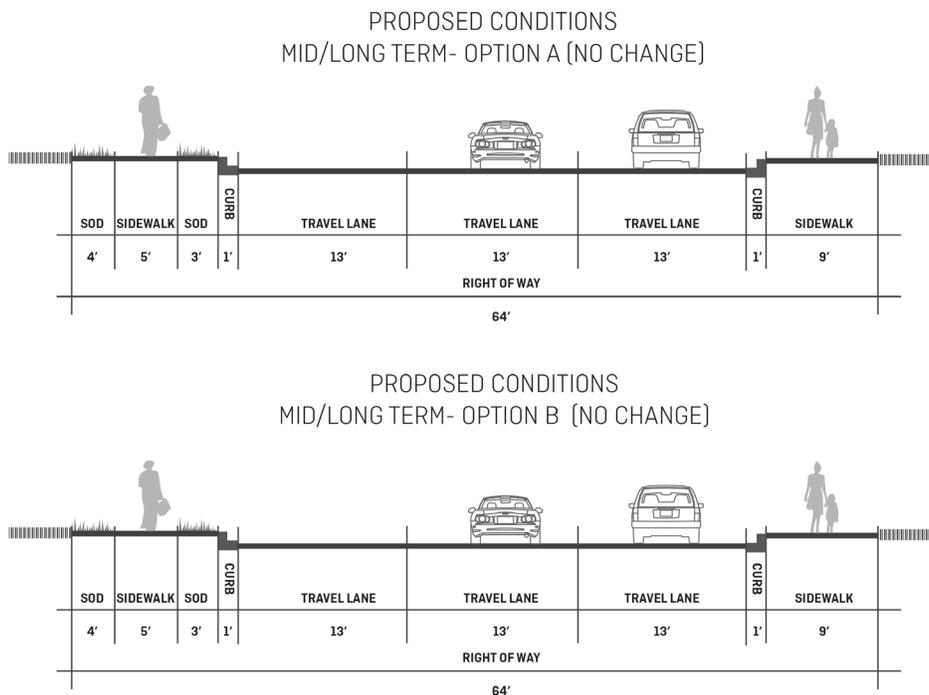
King Street at Florida Avenue (East Bound)
